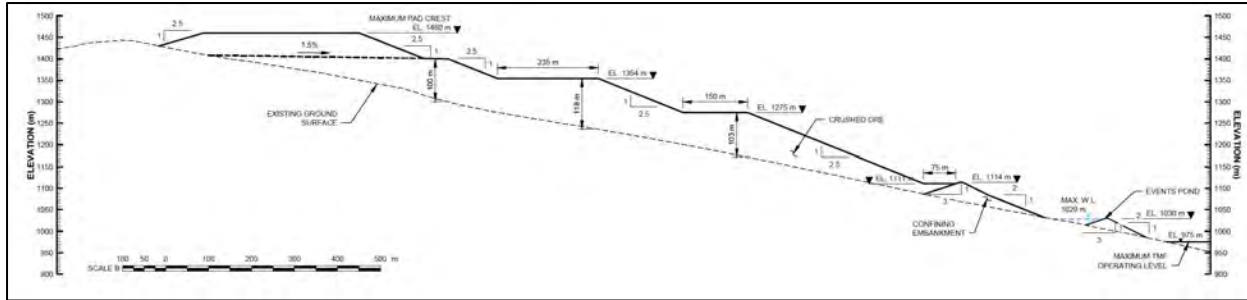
Heap Leach Facility Cross-Section (KP, 2021)
